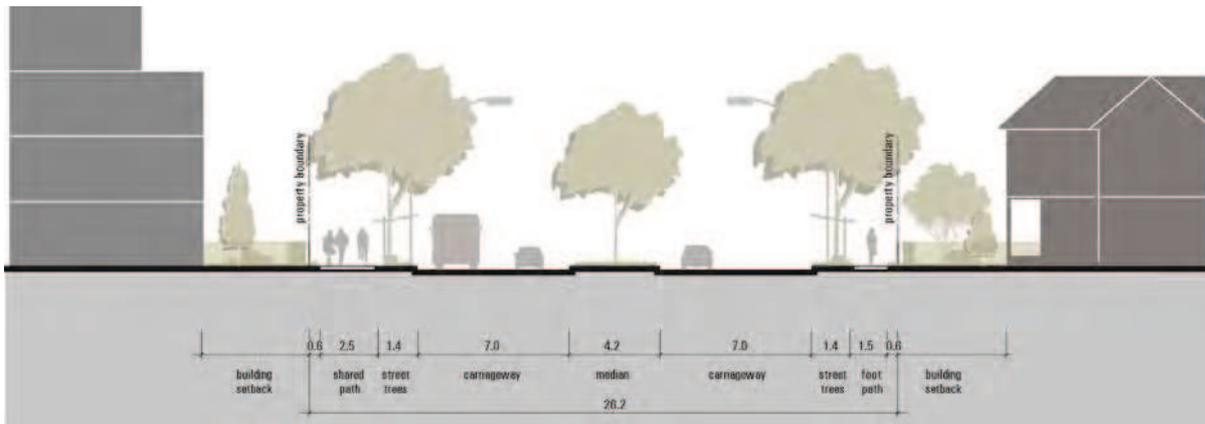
Sub-arterial Road (Terry Road between Windsor Road and Killarney Chain of Ponds)
